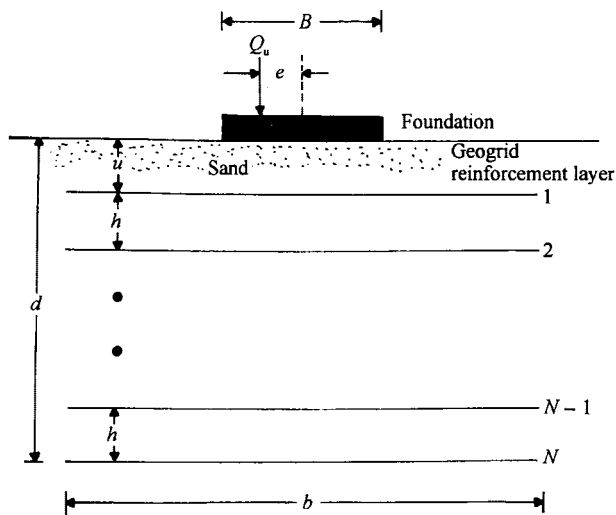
Strip surface foundation supported by a sand layer reinforced with geogrid.
